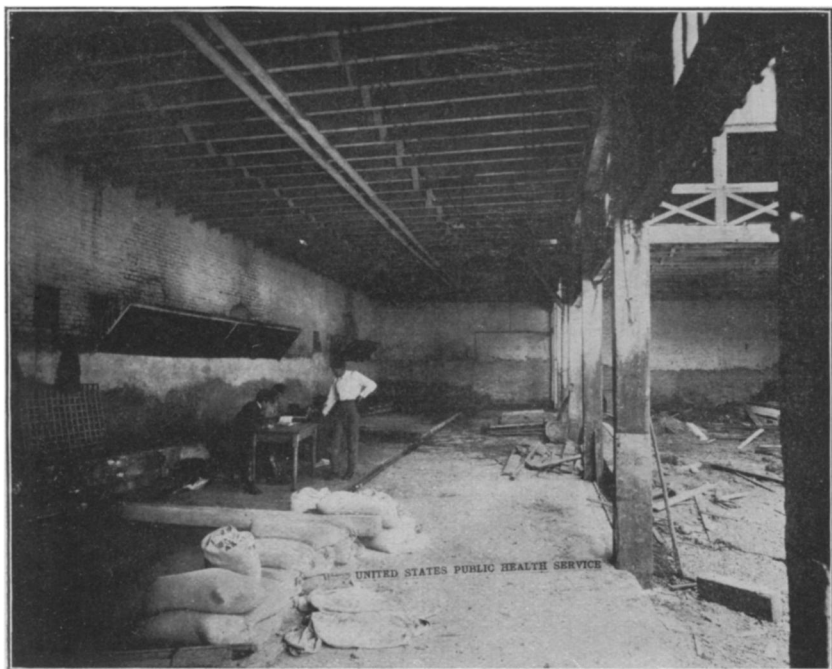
GROUND AREA OF STABLE, SHOWING CONCRETE FLOOR AND CEMENTING OF BRICK WALLS.
